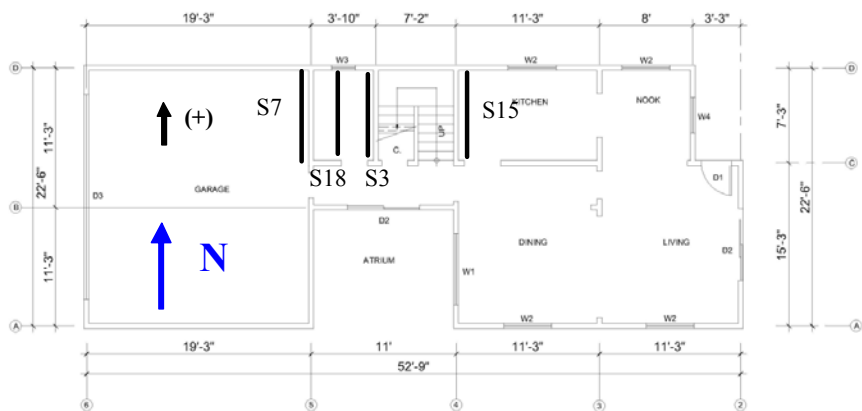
Wall deformations of internal walls for Test NWP5S02
